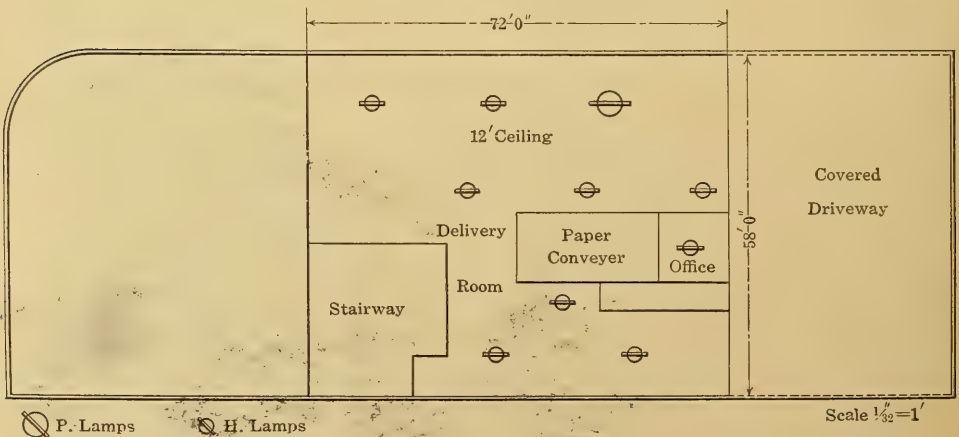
FLOOR PLAN. SHIPPING DEPARTMENT.
